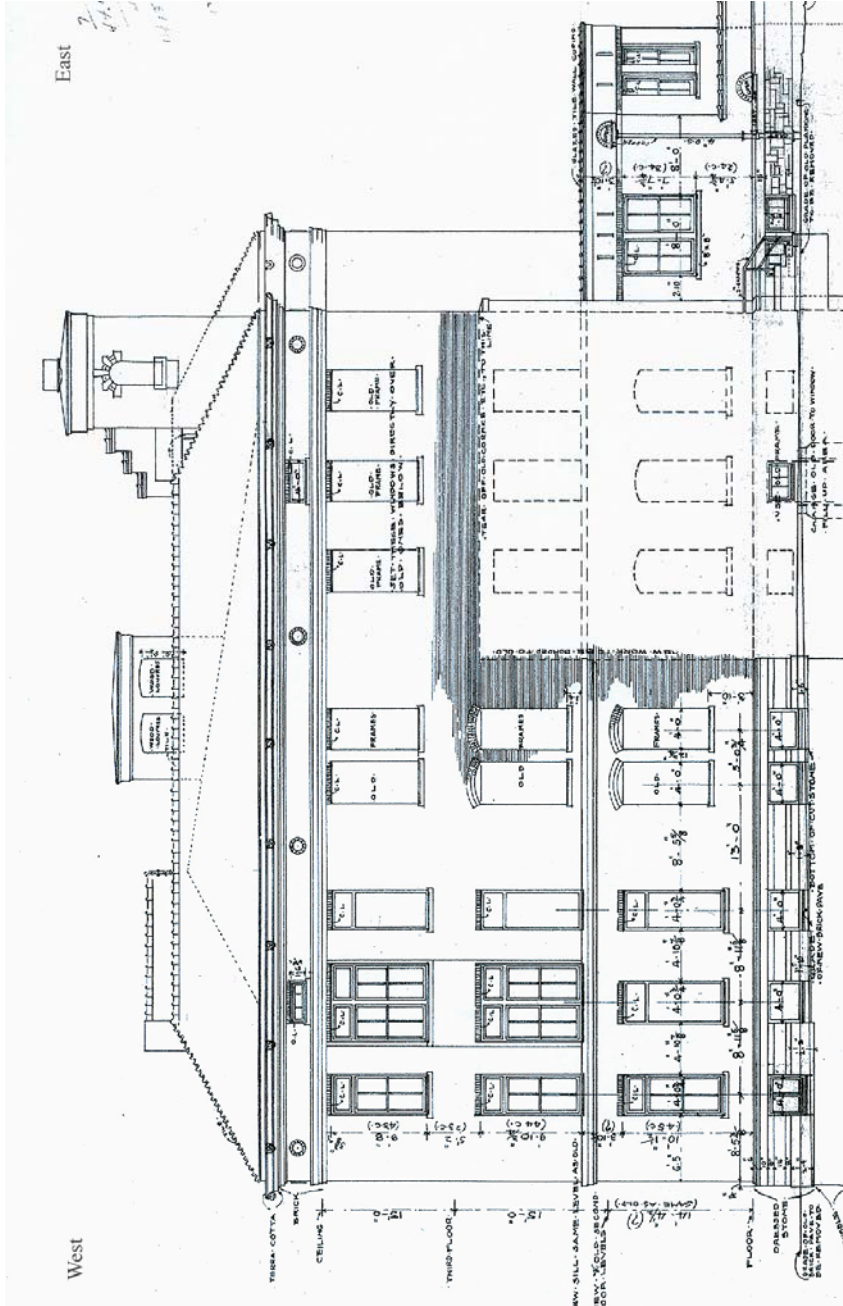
North elevation of Arlington School. SLPS Archives (west at top of page).
